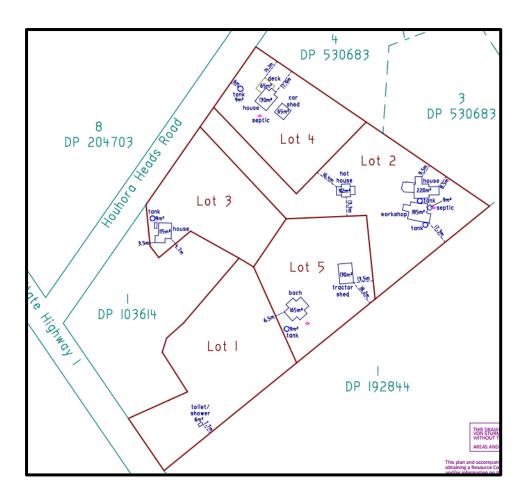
Image of the Buildings and Setbacks Plan prepared by Von Sturmers.
